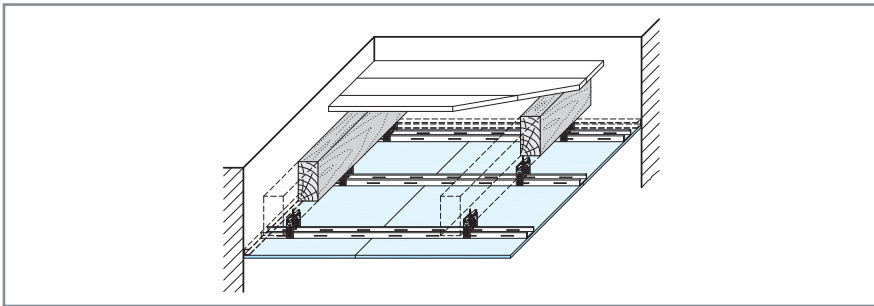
Board ceiling with wooden substructure with one substructure level
